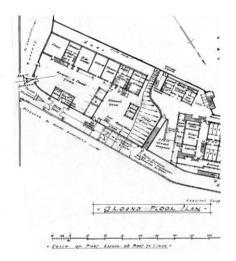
Plan of the proposed Casemates prison, 1956, showing the North Building labeled as a Gate House.
